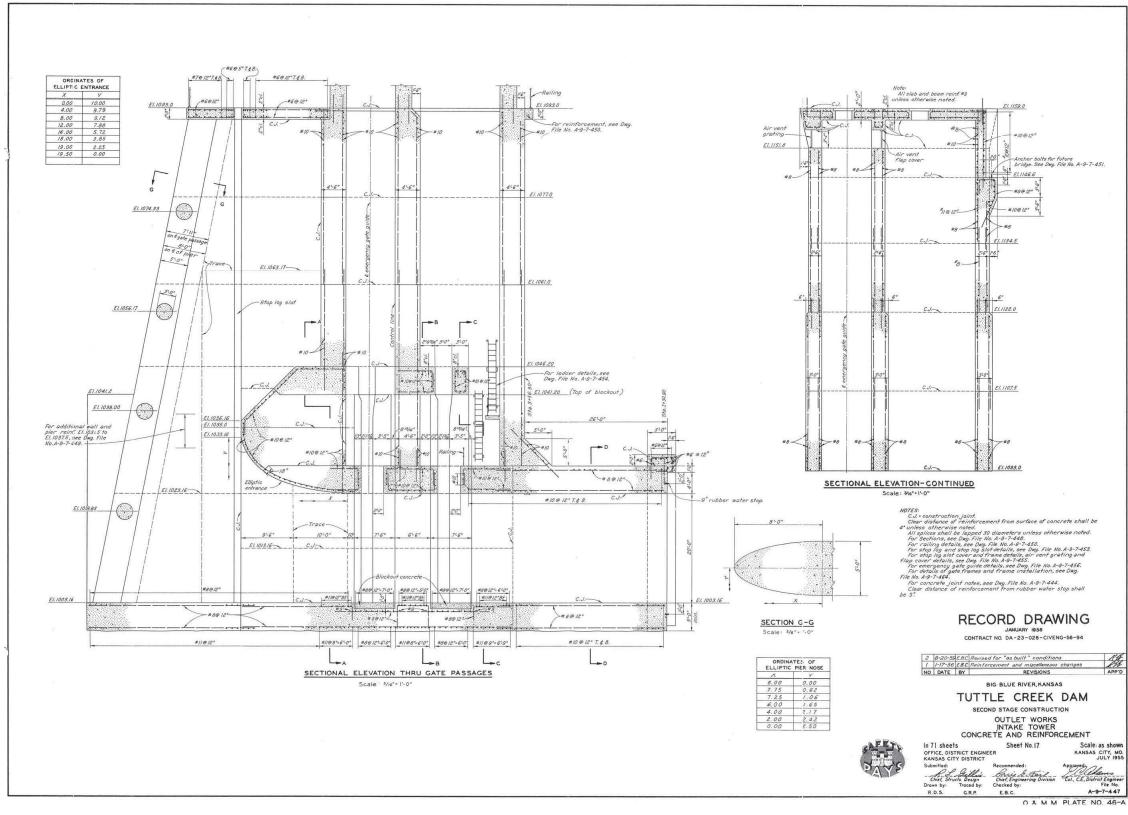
Outlet Works and Intake Tower. Elevations in NVGD29.
